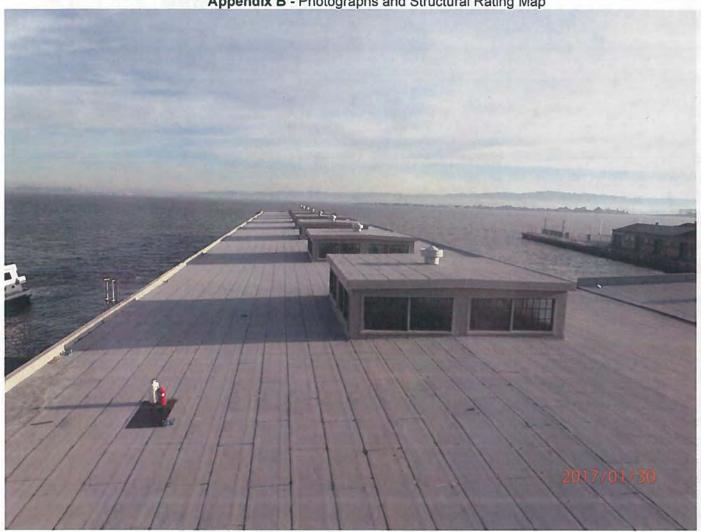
Construction photo of new roofing at Pier 31 shed building.
